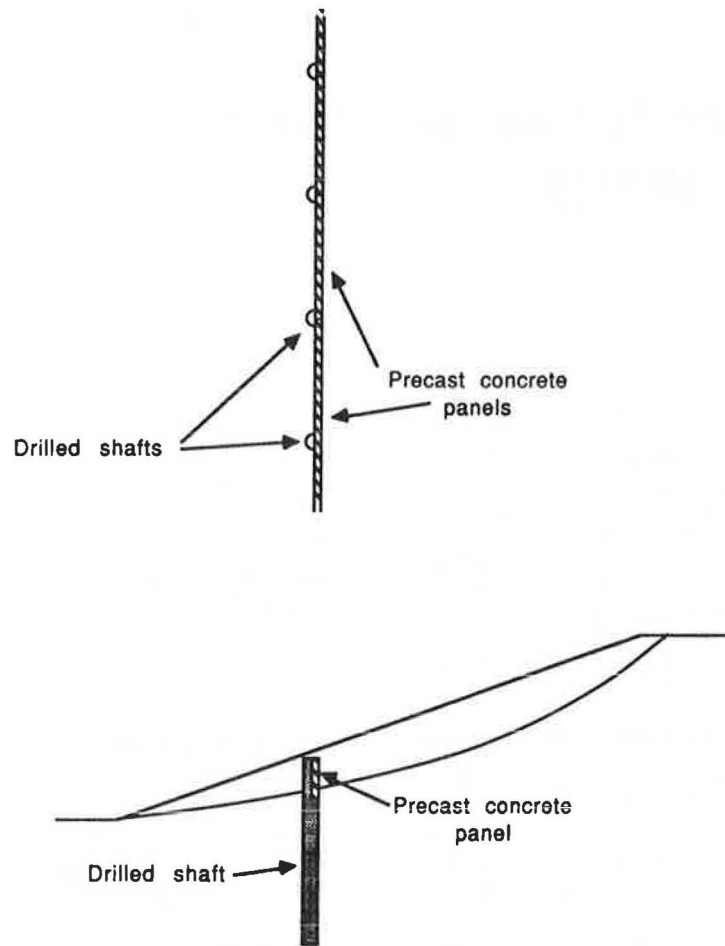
Typical slide suppressor wall used for slope repair: *top*, plan view; *bottom*, profile (cross section).
